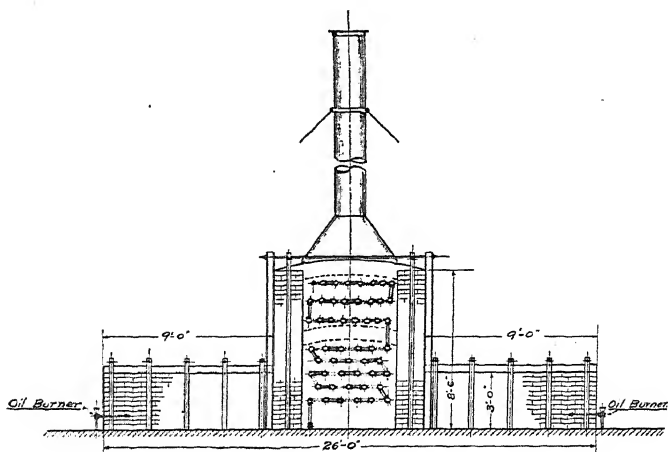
OIL-DEHYDRATING PLANT. END ELEVATION.
